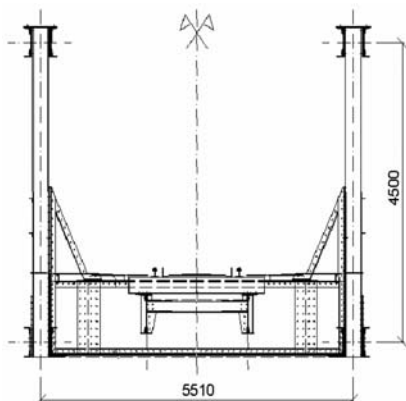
Cross-section of the observed railway truss bridge and its computational model
